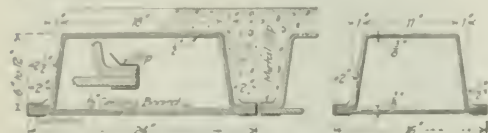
RIBBED CONCRETE FLOOR CONSTRUCTION, USING FORMS AND CEILINGS OF GYPSUM PLASTER-BOARD
